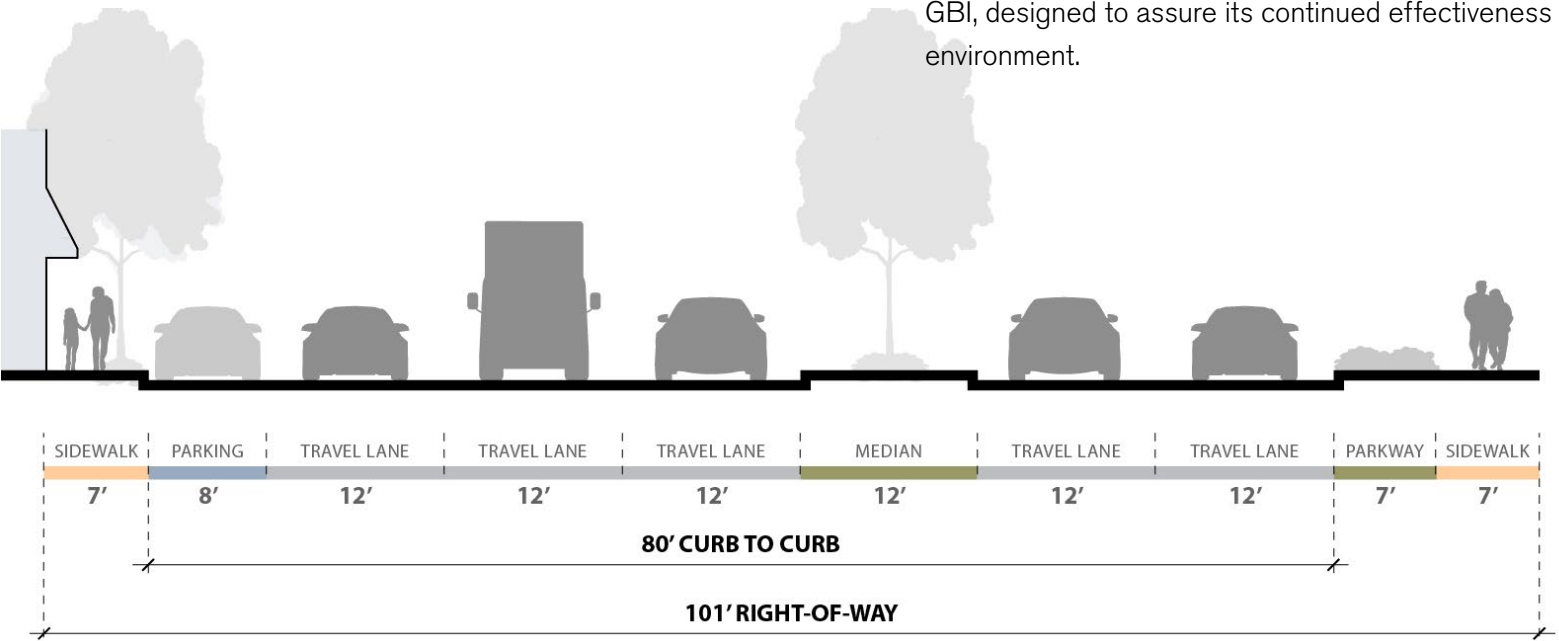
EXISTING STREET CONDITION: EL CAMINO REAL (LOOKING NORTH)
